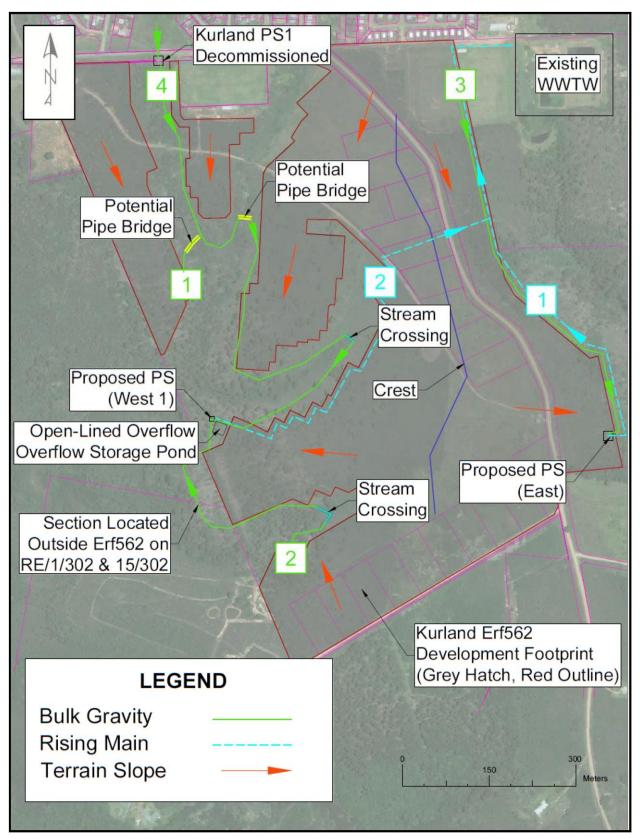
Preferred Sewer Outfall Concept (Appendix F3).
